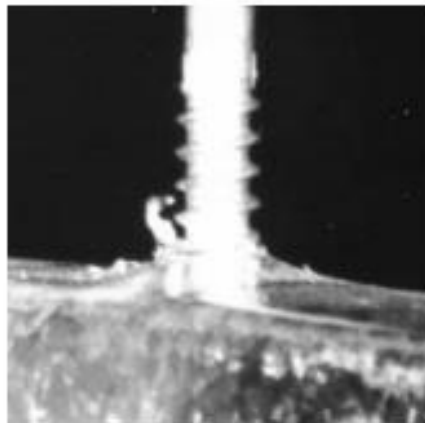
A pull-out failure of screw connection (Mahaarachchi, 2003)
